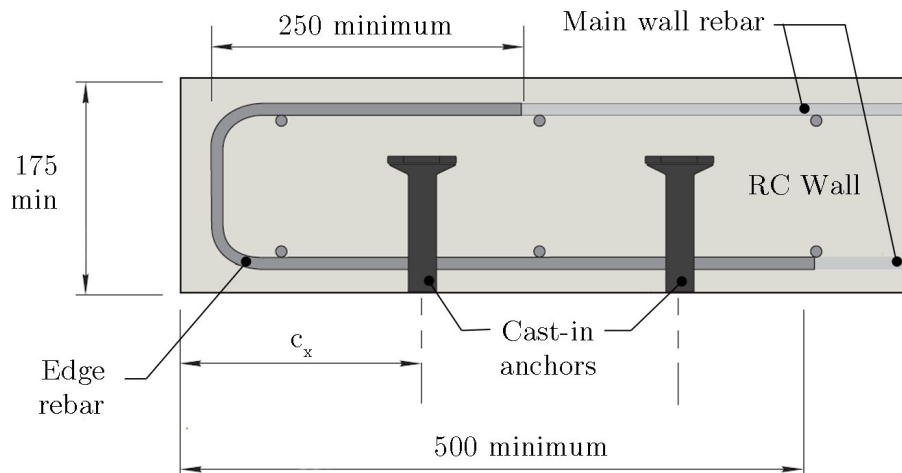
Anchor Edge Reinforcement Details (reworked from Ancon Building Products (2014))
